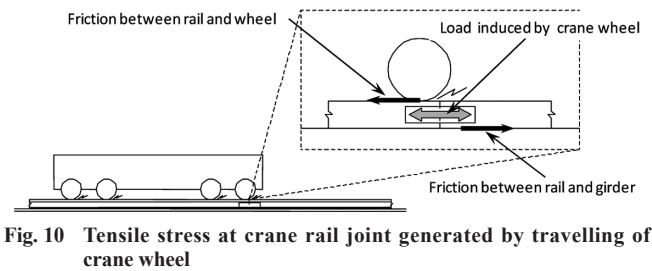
Tensile stress at crane rail joint generated by travelling of crane wheel
